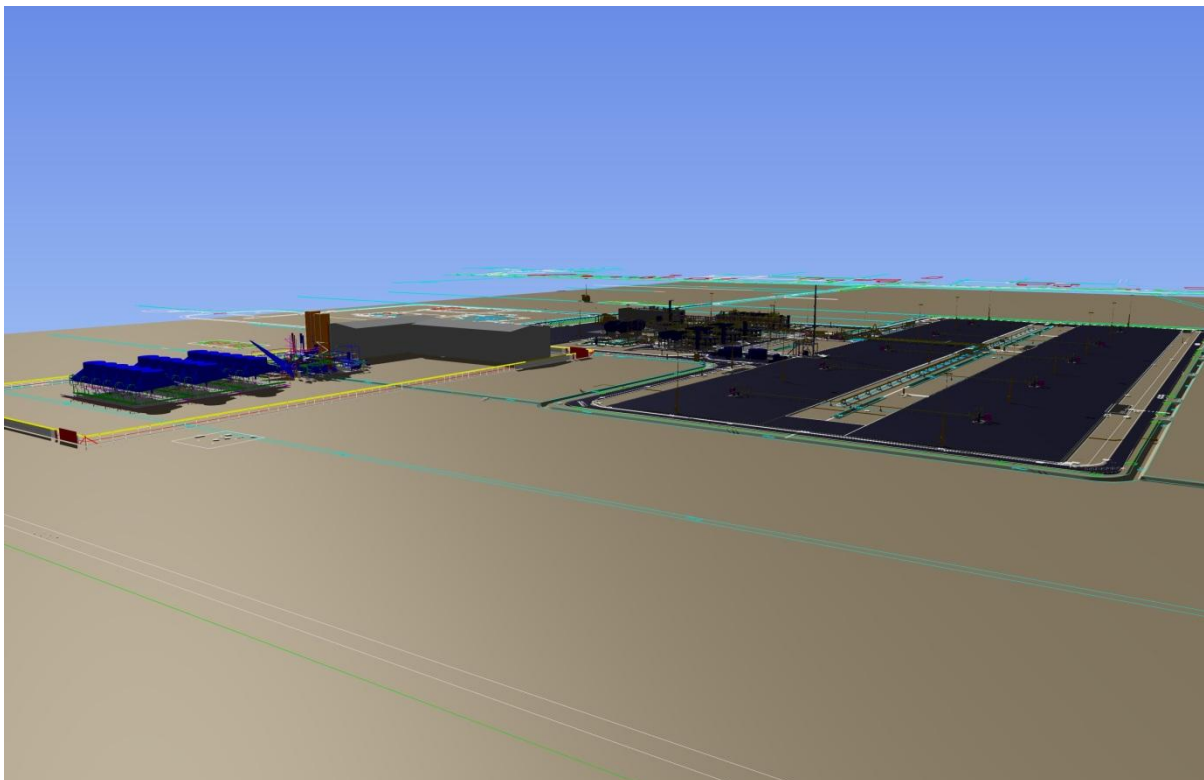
NRU plant aerial view (with existing production facility to the right)
